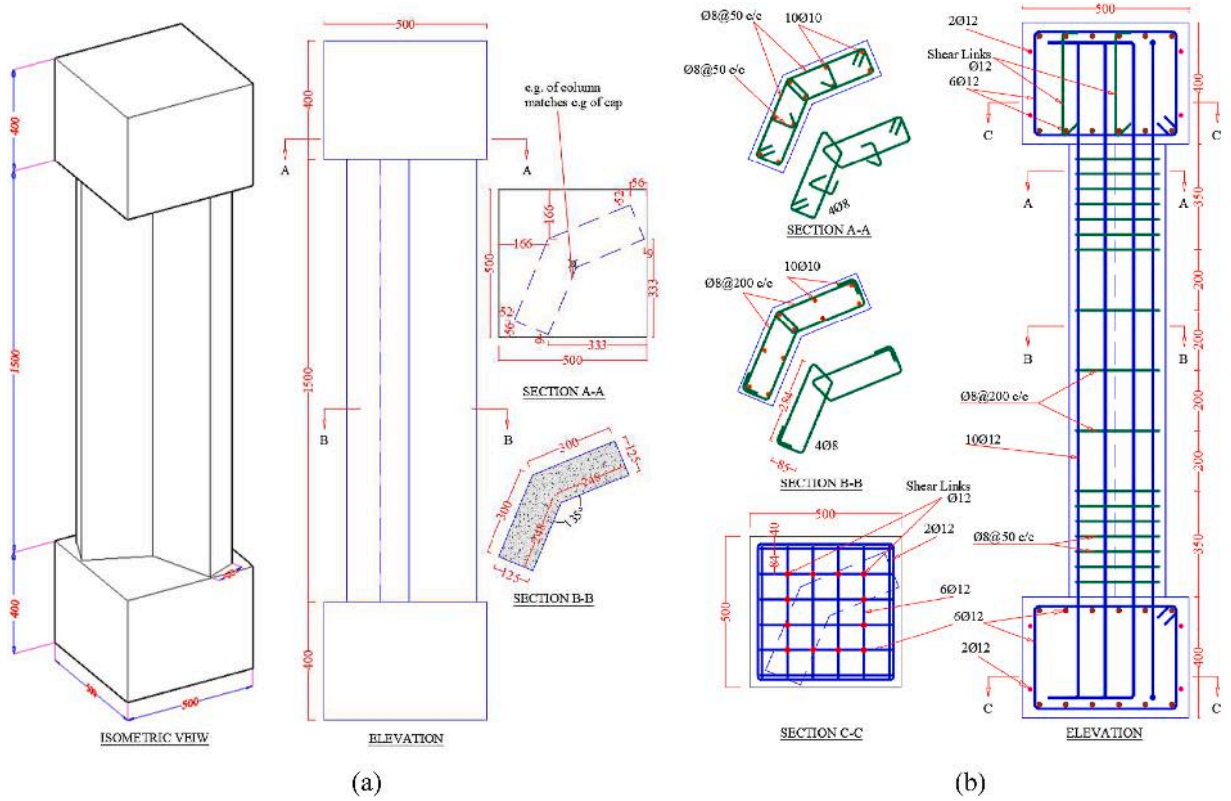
Details of 135° L-shaped specimens: (a) Concrete dimensions; (b) Reinforcement details (Dimensions in mm).
